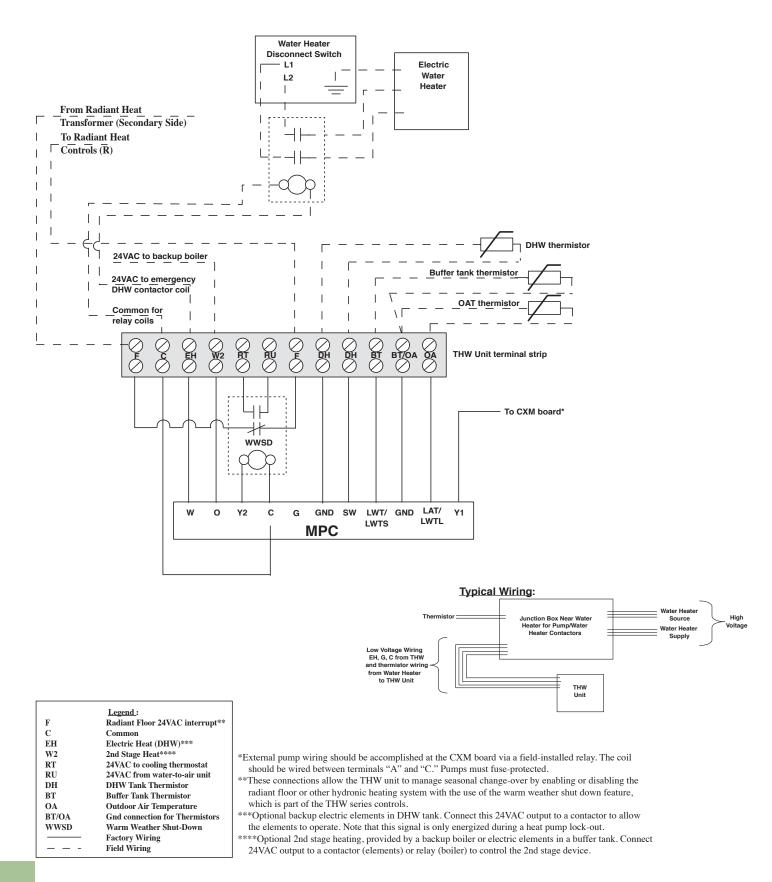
THW Unit - Internal Pumps / No Cooling / DHW Tank
